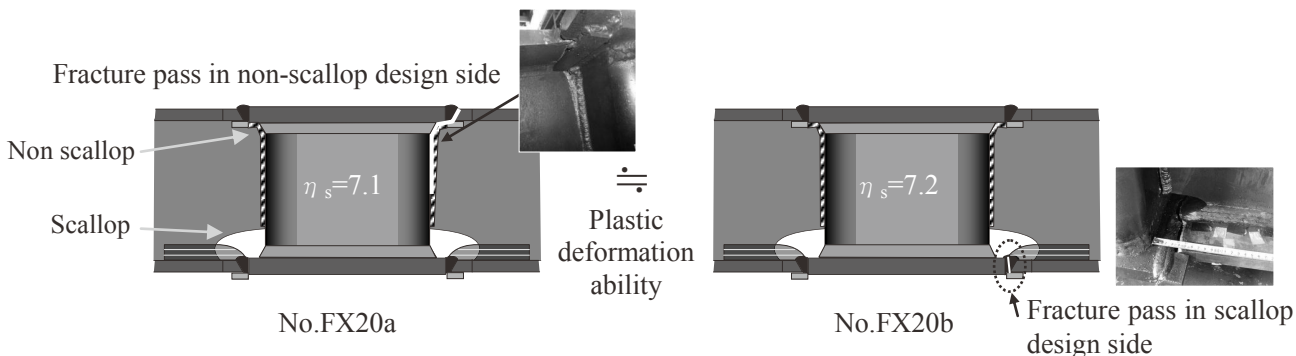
Fracture passes of each same assemblies of $T_D=20$ mm overlay welding around toe of scallop
